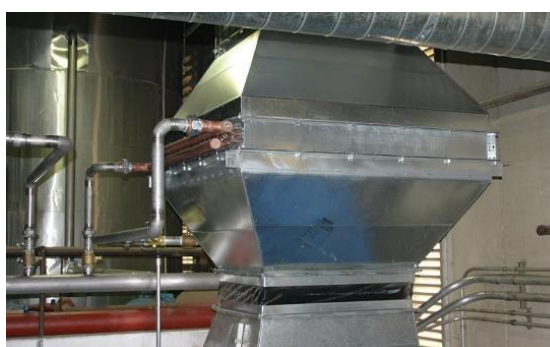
Installed finned tube heat exchanger on the top of compressor after cooling fan
